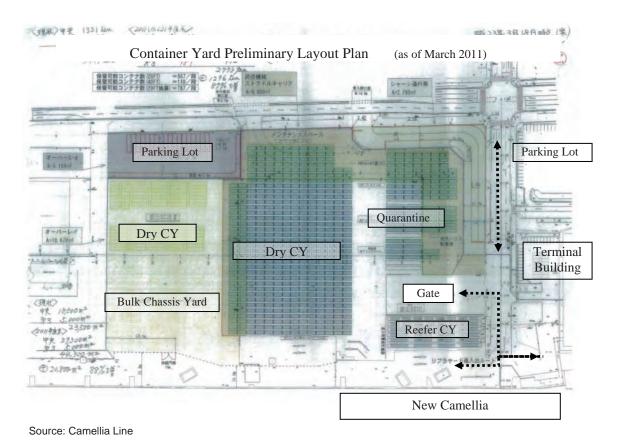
Camellia Ferry Terminal Container Yard Plan
